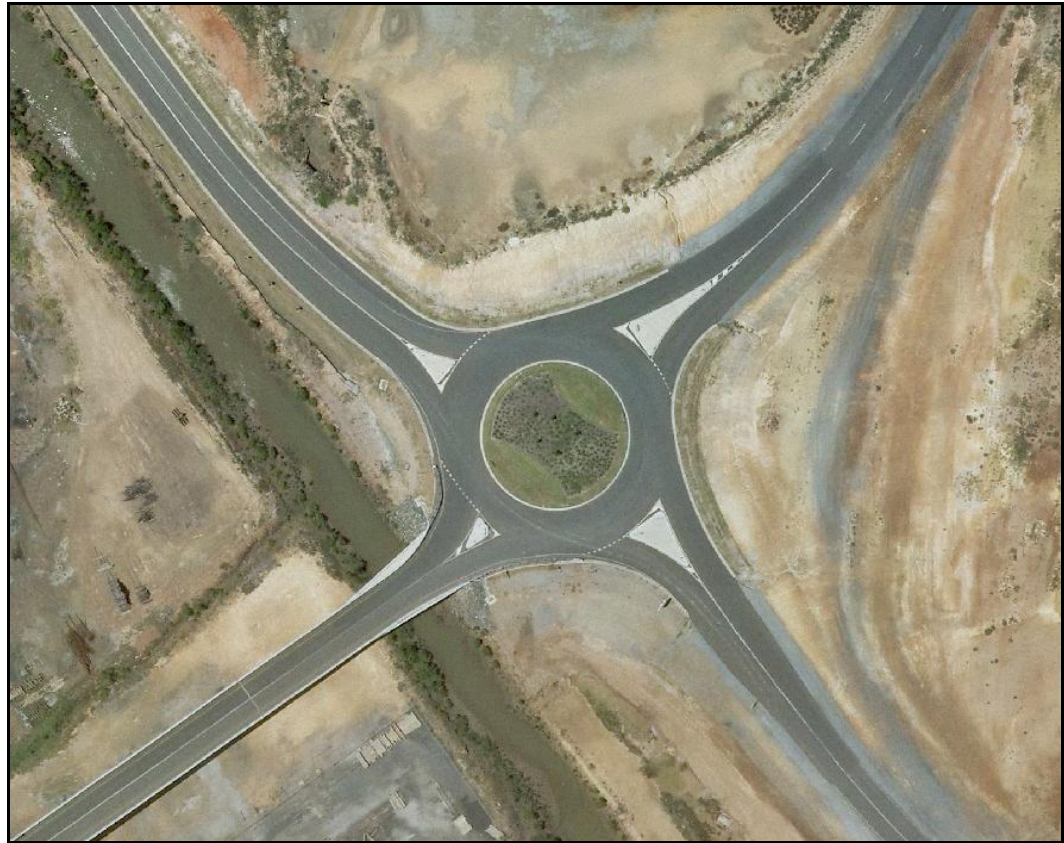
Port Access/ Mark Fenton Dr/ Tug Berth Access Rd – Existing Layout
